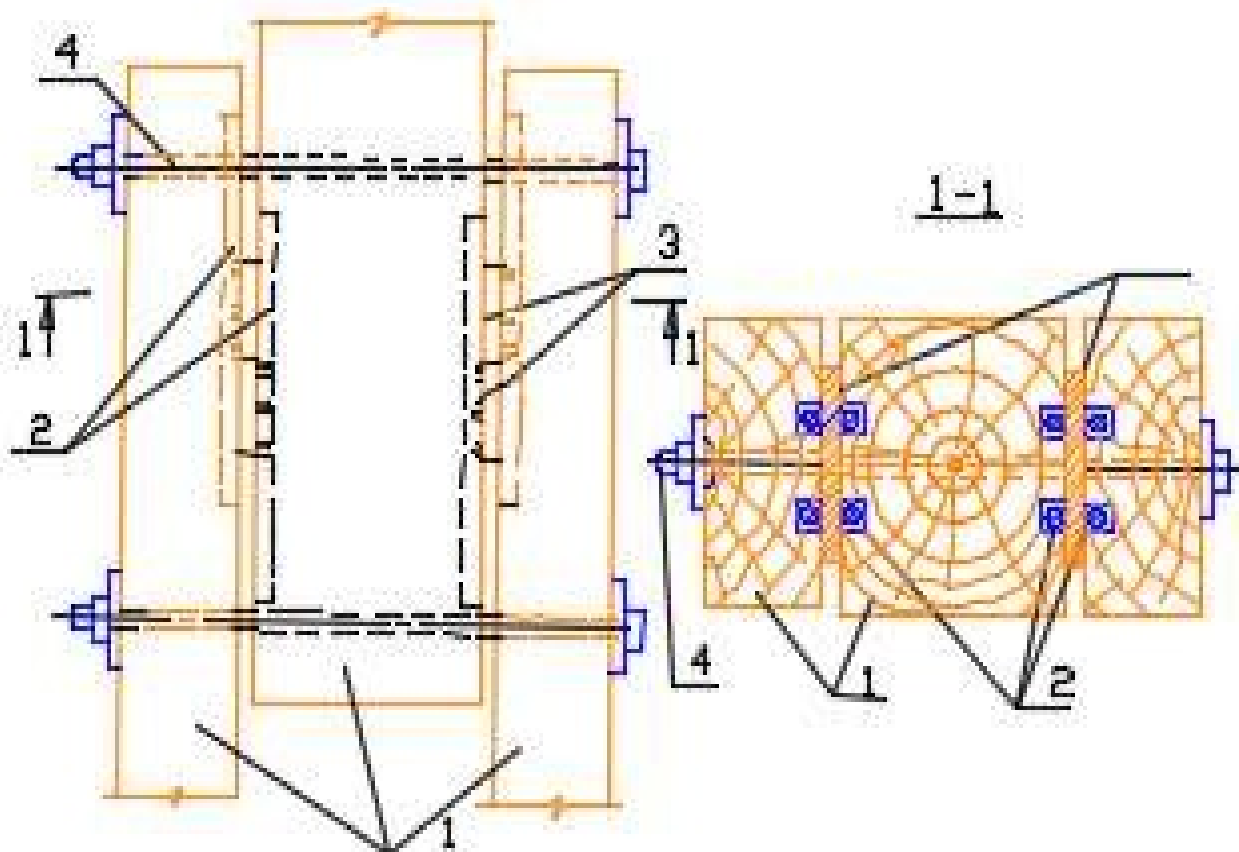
Butt joint of elements of wooden structures (NISS): 1 - joining wooden elements; 2 - reinforcing bars; 3 - steel plates; 4 - coupling bolt
